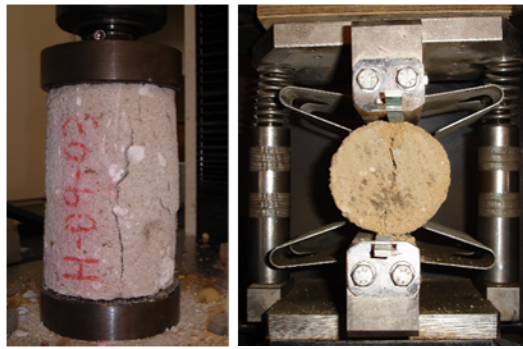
Simple compression and splitting tests on adobe specimens.
